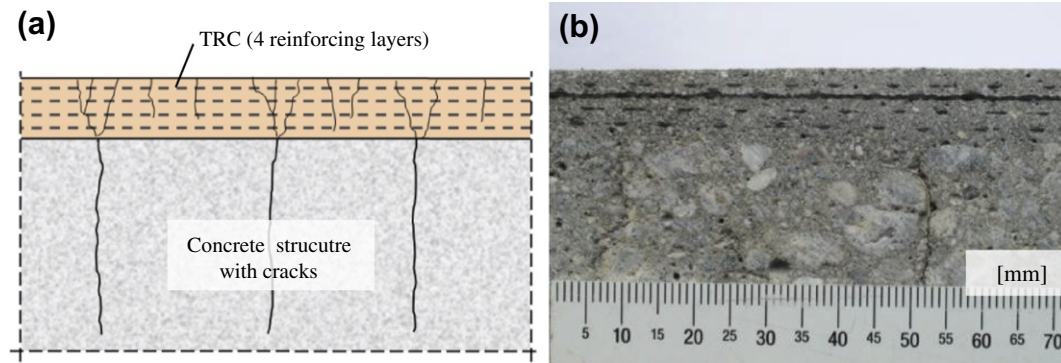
Schematic view (a) and example (b) of cracked concrete member with TRC with 4 reinforcing layers made of carbon textiles.
